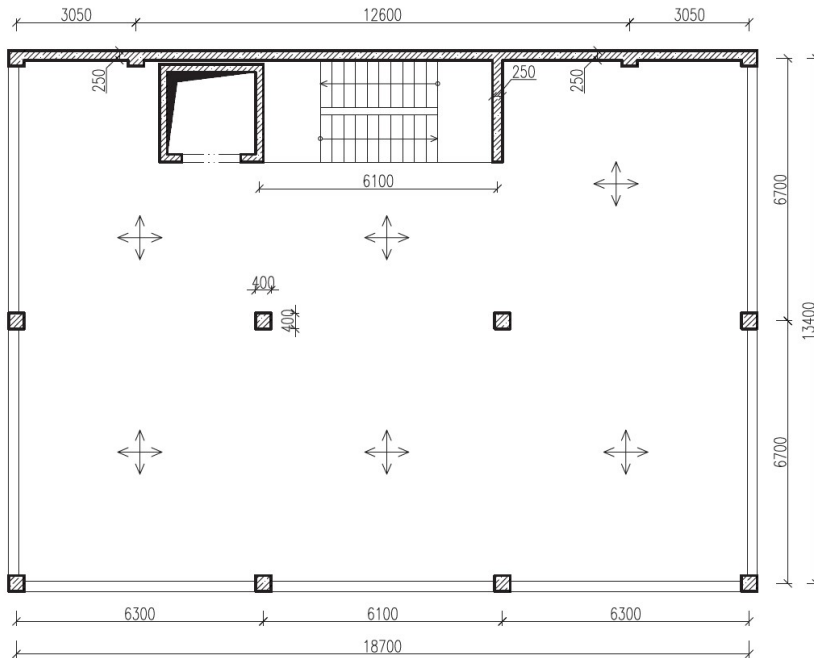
The scheme of a structural system of the 4th floor of the superstructure
